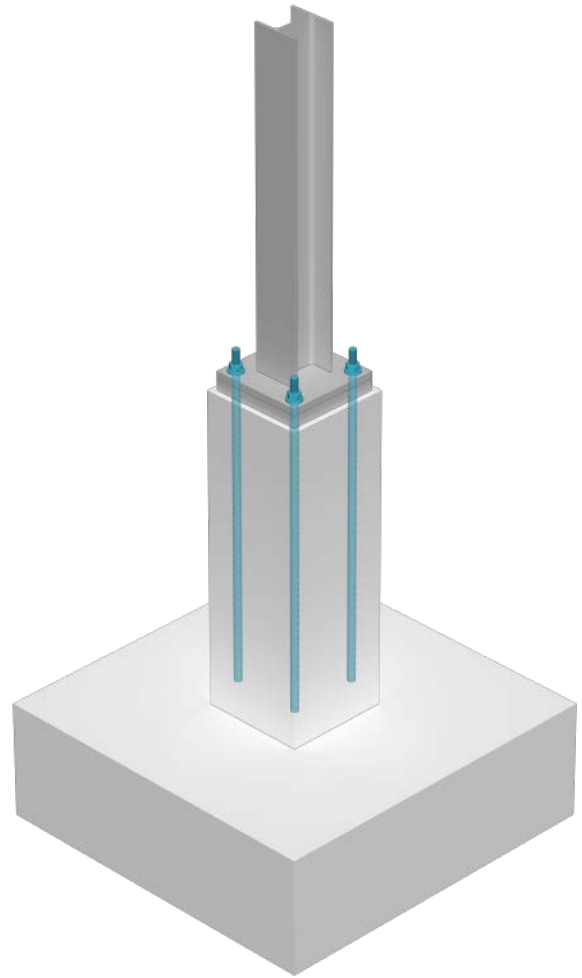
HPM® P Rebar Anchor Bolts in a steel column to base column connection.
